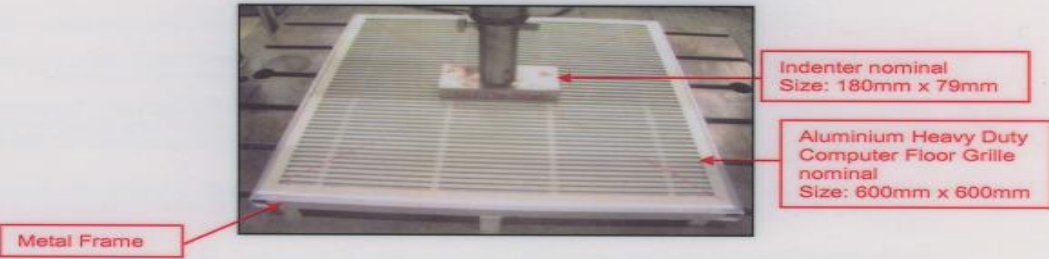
Aluminium Heavy Duty Computer Floor Grille Before Test
